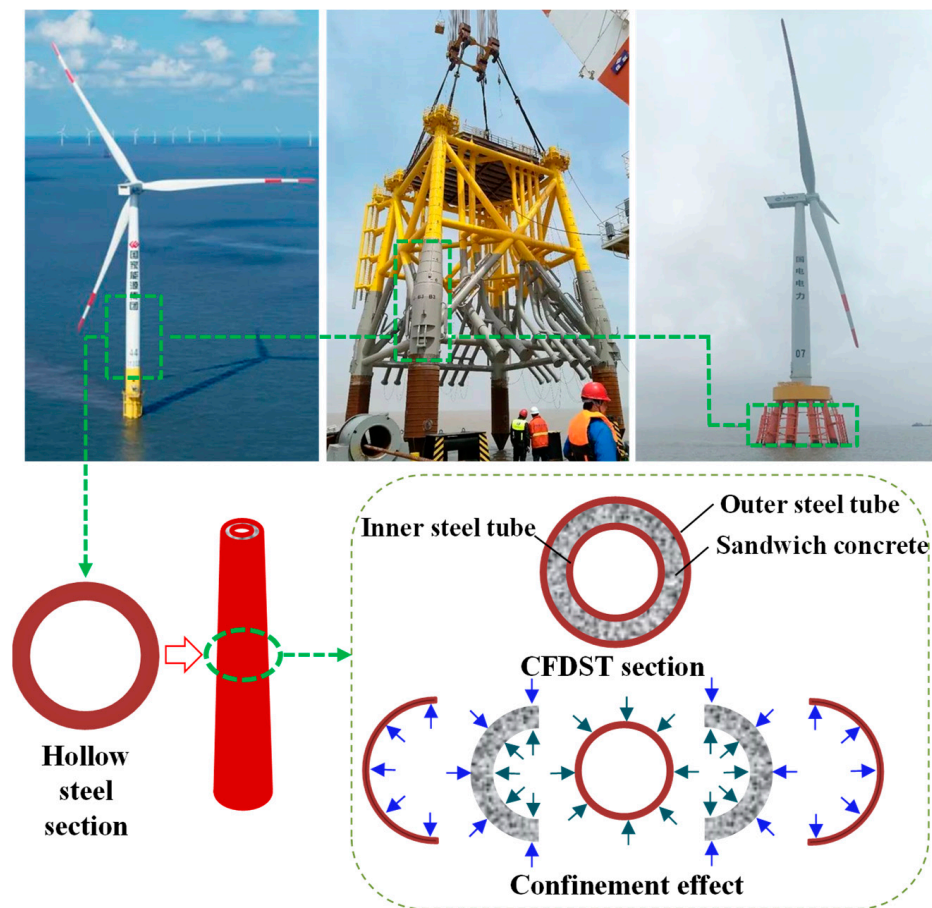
Engineering utilization of support structures of tapered CFDST members. The arrows are to reflect the contact pressures of double-skin tubes to sandwich concrete.
